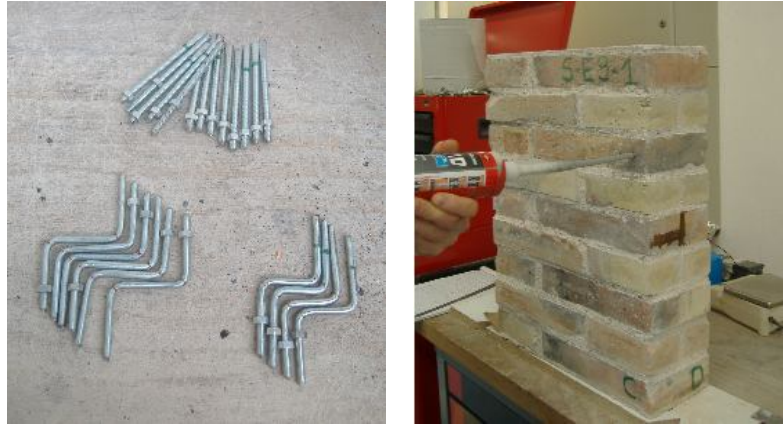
Specimen preparation: detail of the $\varnothing=4$ mm threaded steel bars (left) and positioning in the drill holes through bi-component resin.
